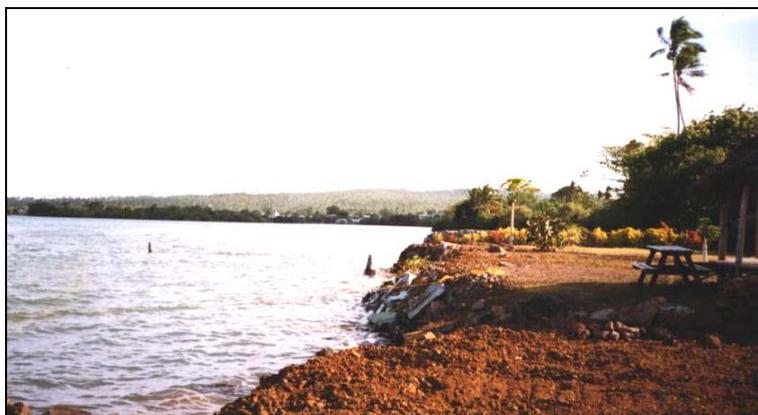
An example of reclaimed area in a hotel being constructed in 1998.
